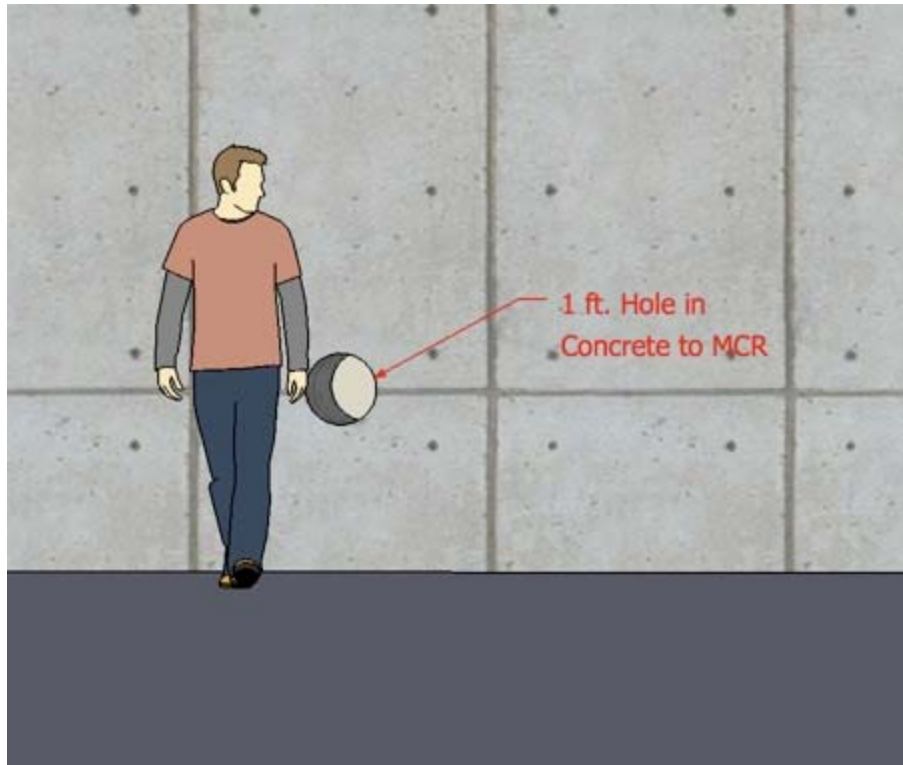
Postulated Hole in Concrete Wall Connected to MCR
